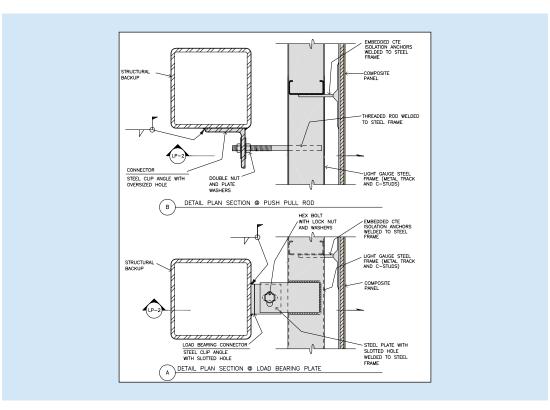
Section view: FRP panels with steel frame support – Type 2
